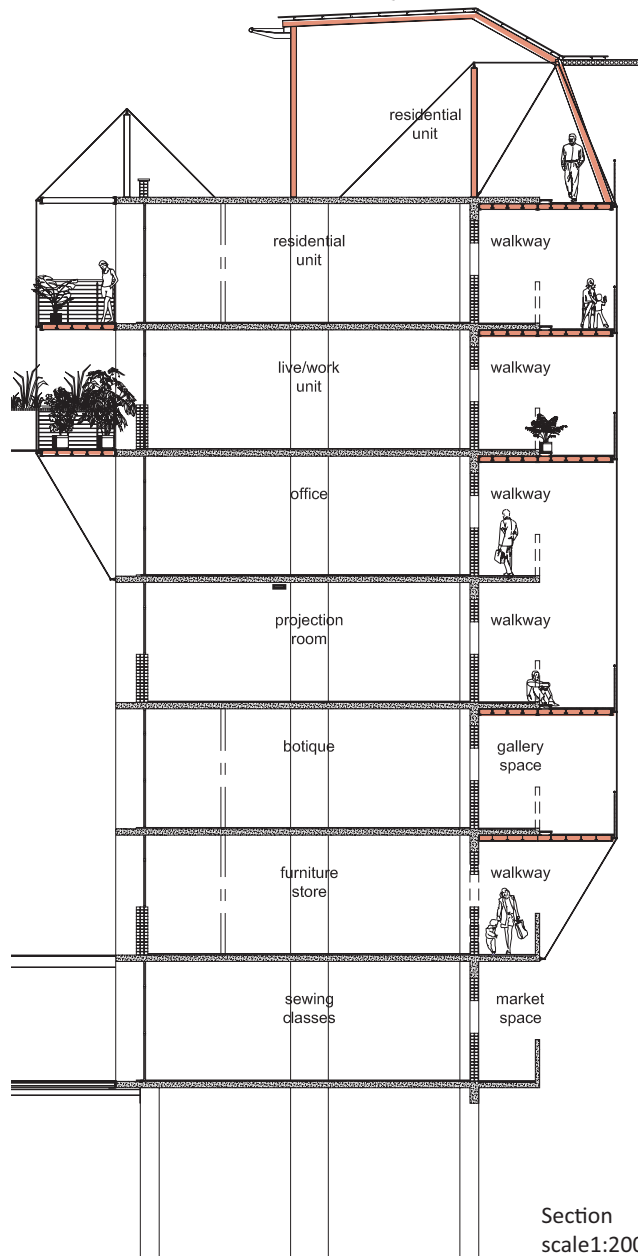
Solid trusses have been [re]placed with hanging floors [re]sulting in a much more elegant system
